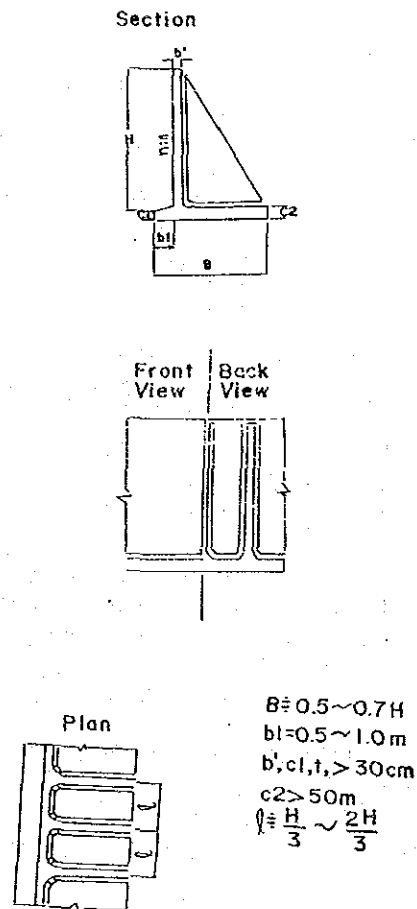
COUNTERFORT TYPE RETAINING WALL
